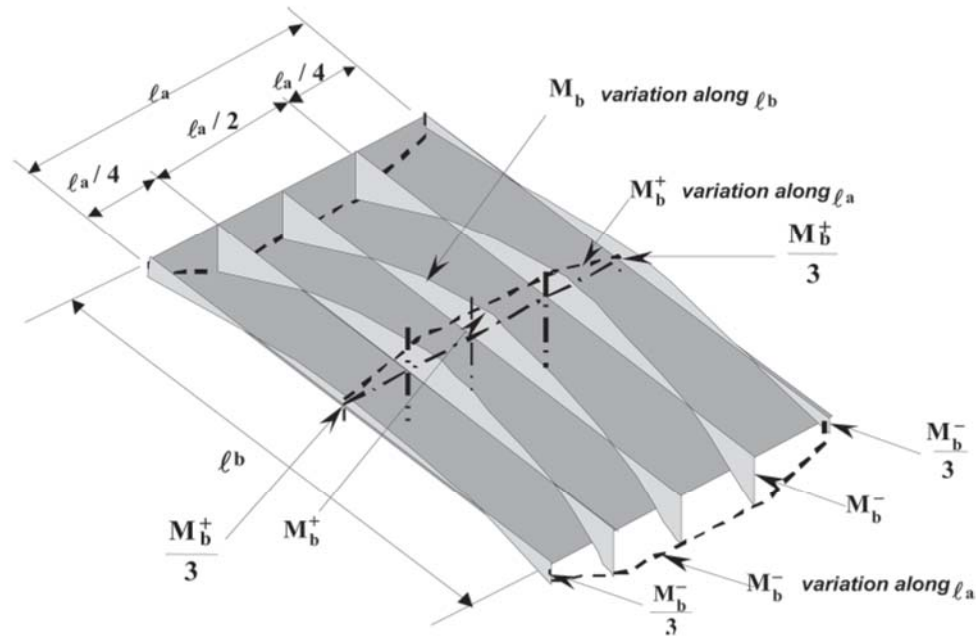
Variation of moment M_b across the width of critical sections for design, two-way slabs supported on girders, beams, or reinforced concrete walls.
